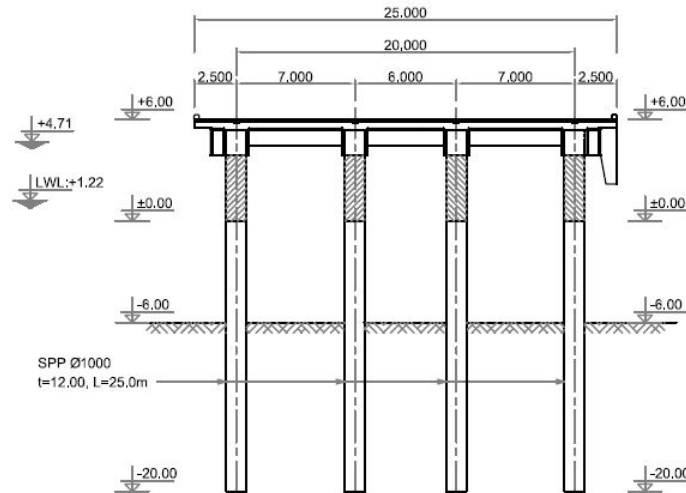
Typical Cross Section of Discharging Berth from Stockyard
